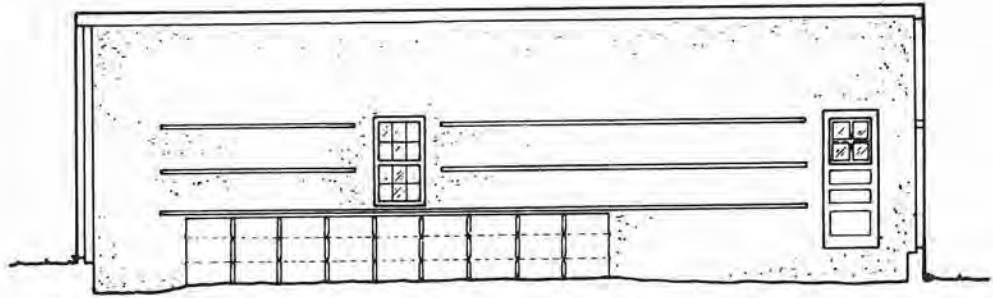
Elevation Drawing of North Wall of Greenhouse (South Wall of House)
